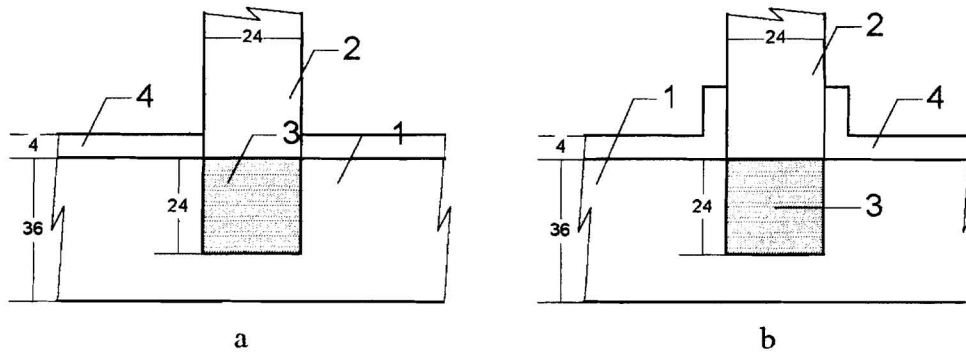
Junction between the internal and external walls: a- thermal insulation only at the exterior wall, b- added thermal insulation at the interior wall; 1- masonry external wall, 2- masonry internal wall, 3- reinforced concrete pillar, 4- additional insulation layer
